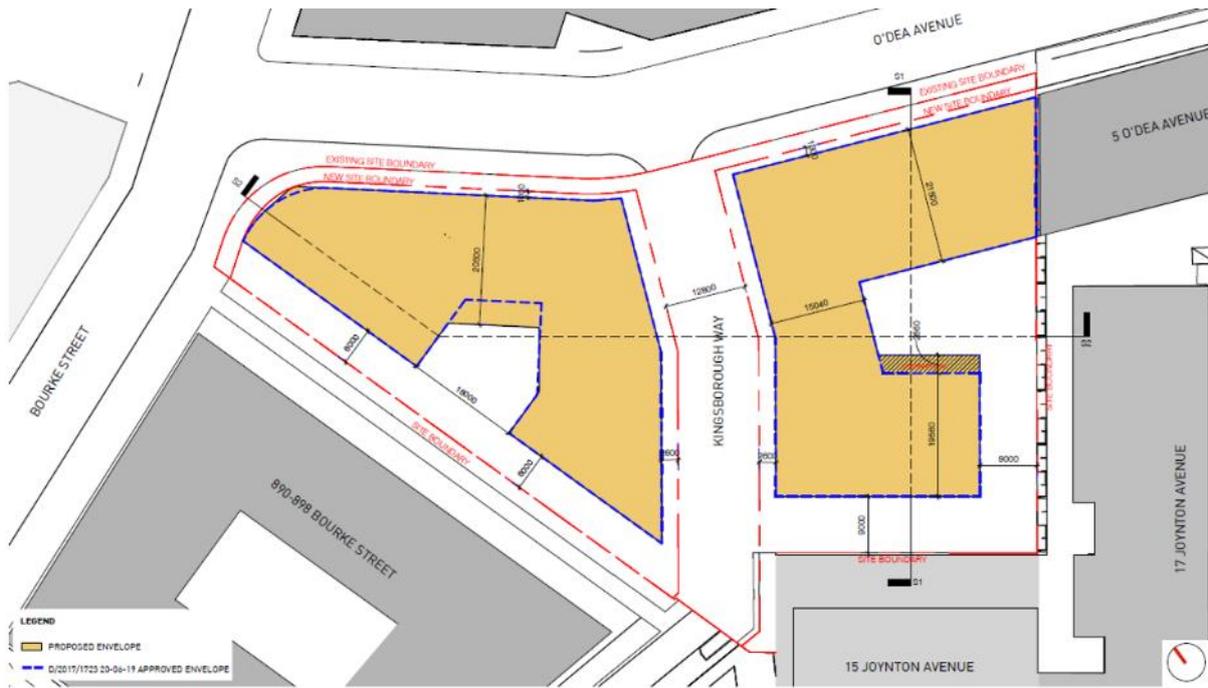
Proposed ground floor envelope plan for D/2017/1723/A, with the approved envelope outlined in blue
